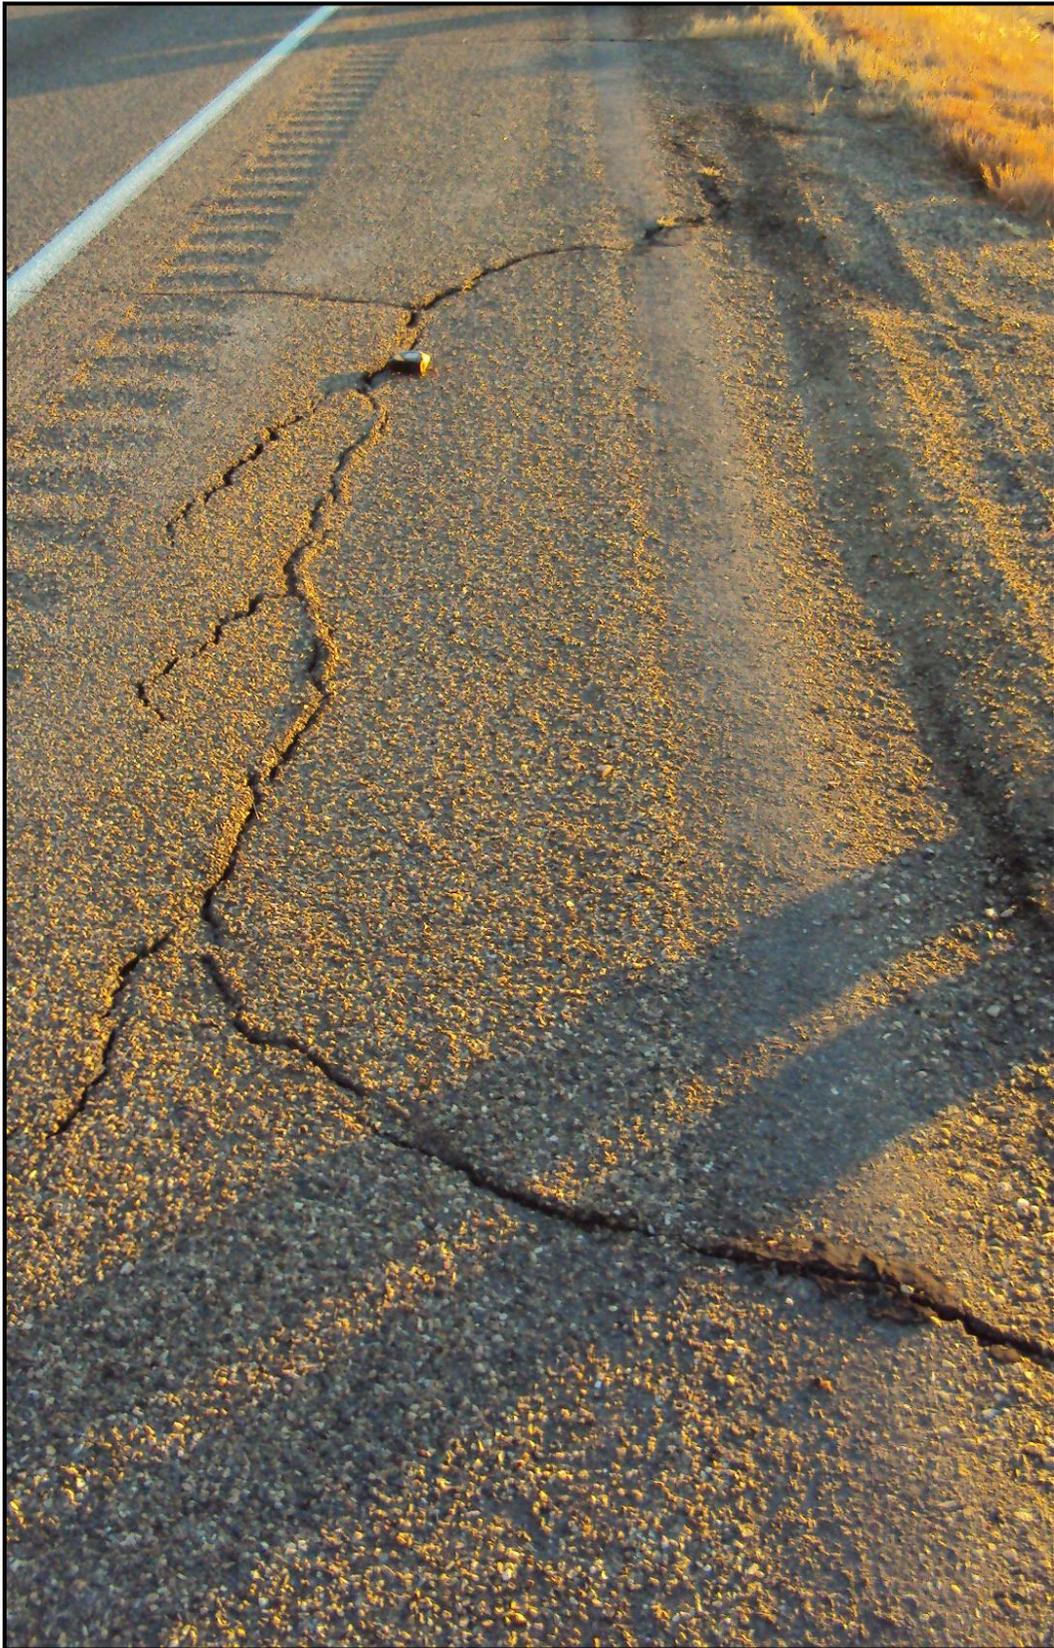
Looking north on MT 16 at Morgan Creek bridge undercrossing. RP 12.5.
